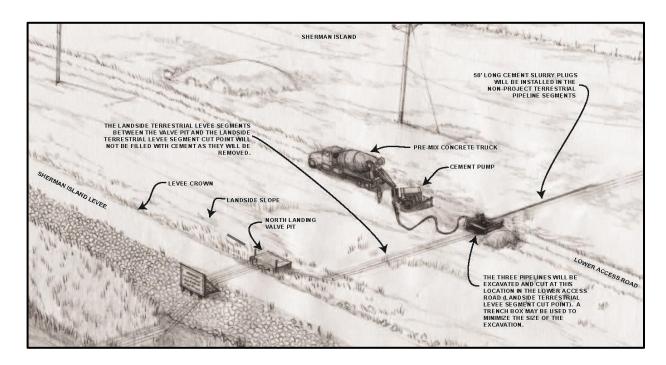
Cementing Landside Terrestrial Levee Segment (Northern Landing)
